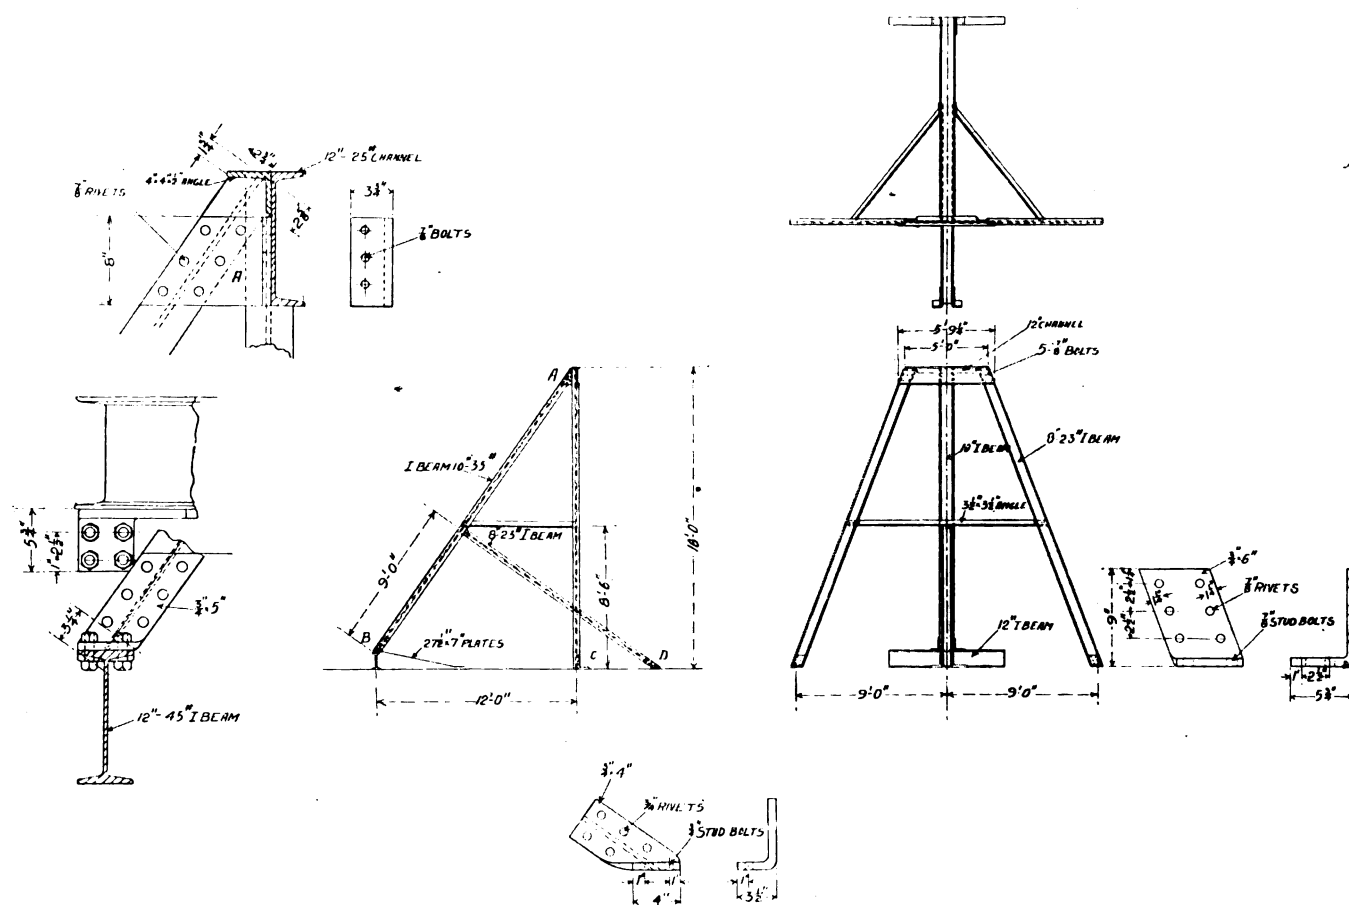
DETAILS OF STEEL TRIPODS USED IN RIGHTING THE CAPSIZED BARGE.
